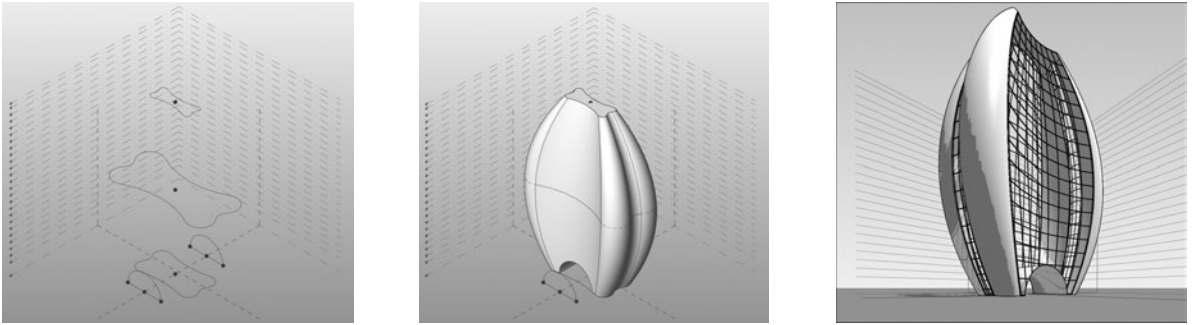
Revit mass objects can have freeform shapes then become more detailed with added object types. Model images made available by David Light—Revit specialist, HOK London.
